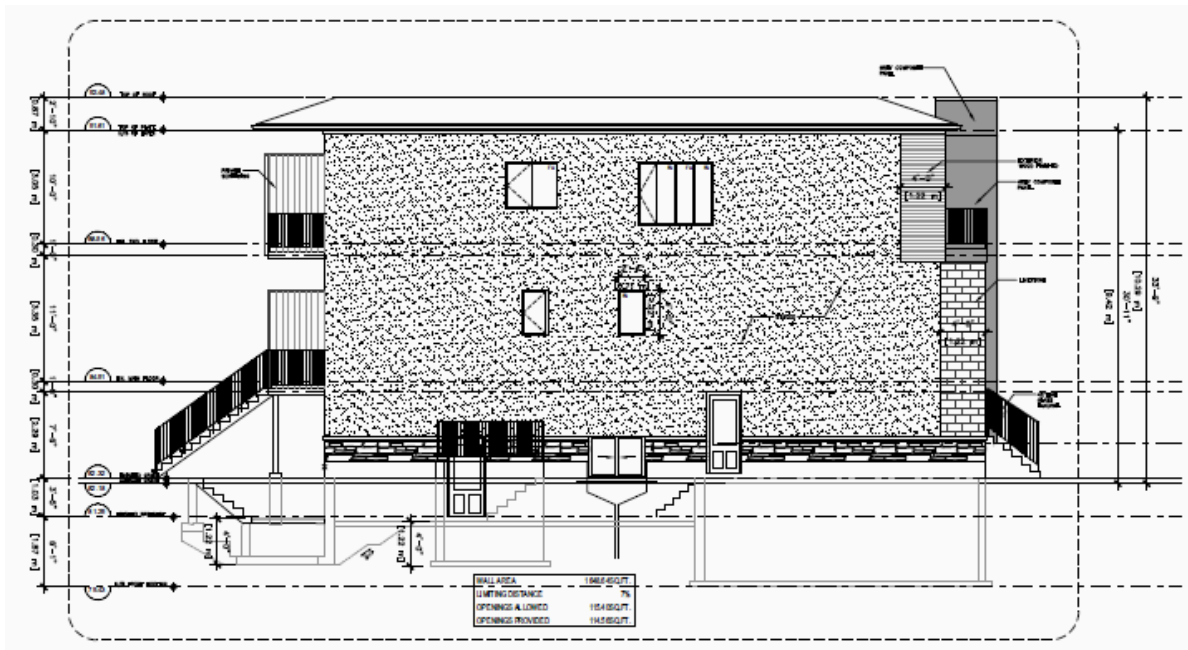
South elevation of 10 Mississauga Road North. *(Image from owner.)
